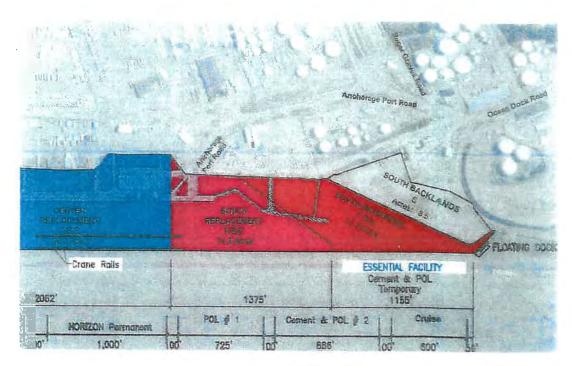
PIEP Draft Phasing Plan v6 Detail
